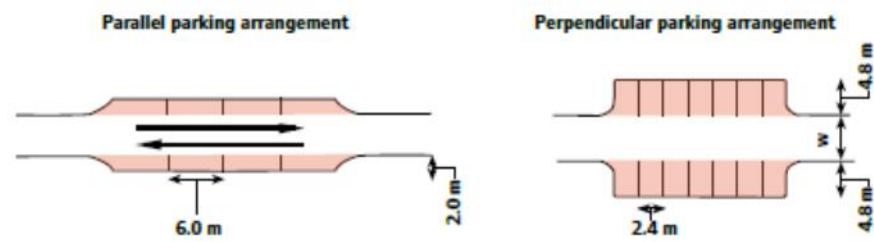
Suggested parallel and perpendicular parking arrangements.
